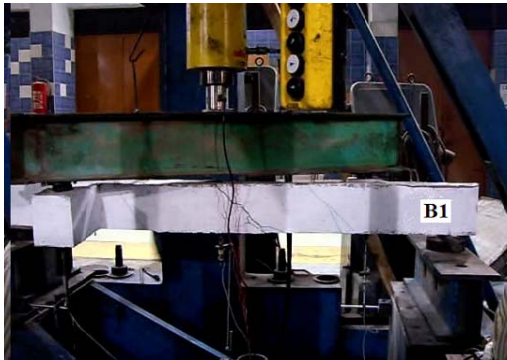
(b) Failure modes and crack patterns of the tested beam B1
